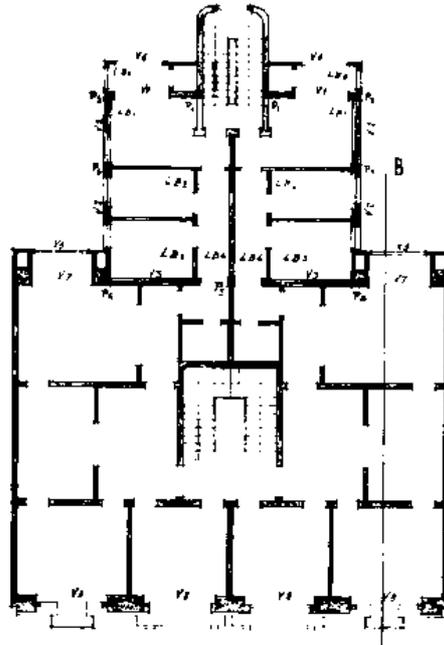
Example of a ‘Rabo de Bacalhau’ building with a reinforced concrete structure in the salient body of the building and with the reinforced concrete slab in the same area (AML).
